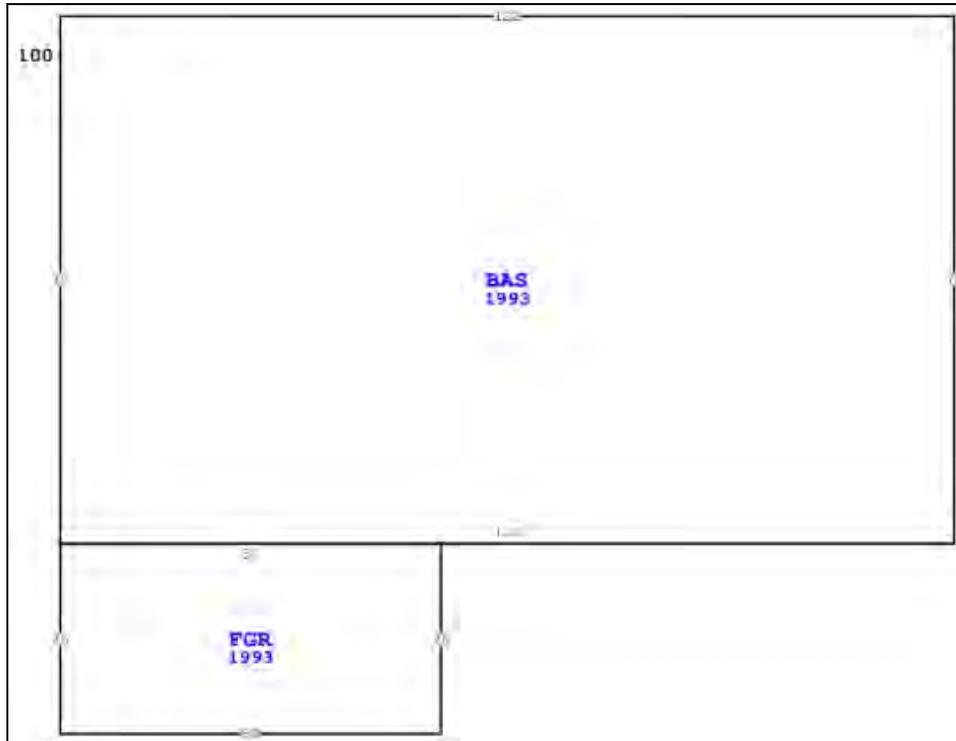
8DE01196, 1965 addition base area plan (DCPA 2024).
